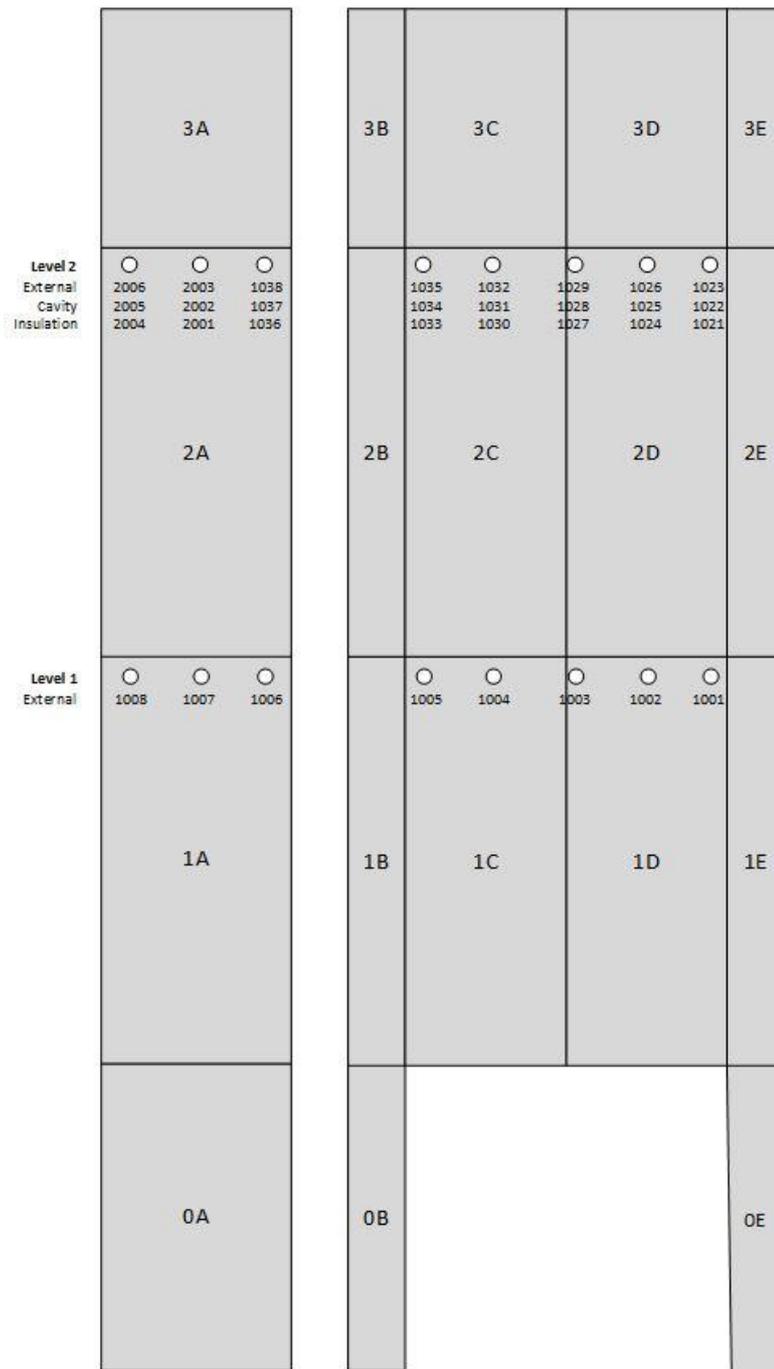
TC positions and panel labelling system (0A – 3E). Not to scale.
